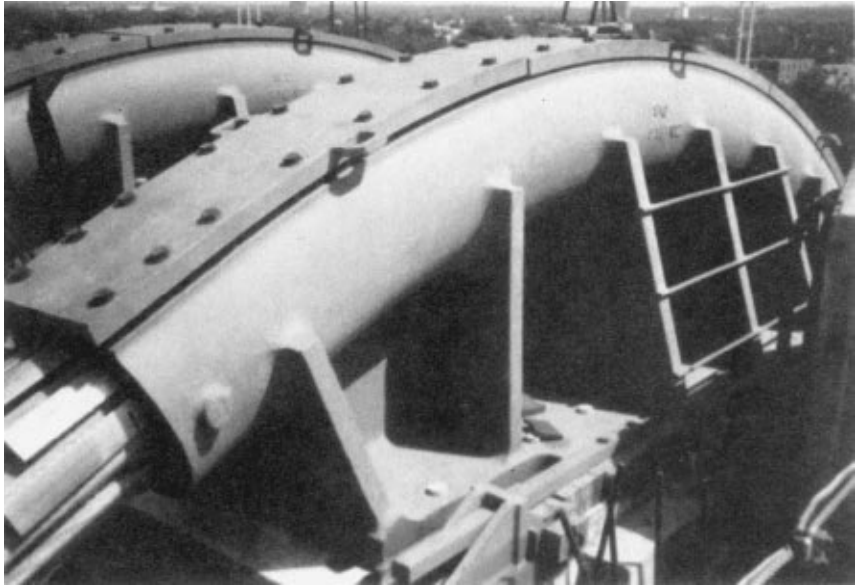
Pylon saddle used for the Hennepin Avenues Bridge.
